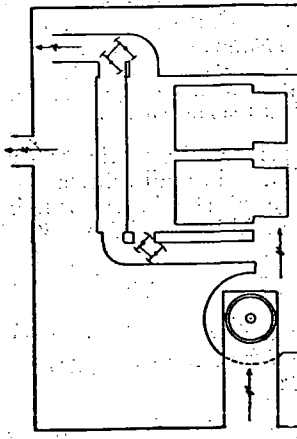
HEATER ARRANGED FOR OUTSIDE AIR WITH WARM AIR CONNECTION TO FAN INLET TO TEMPER AIR, ALSO MIXING DAMPERS FROM WARM AIR AND TEMPERED AIR CHAMBER
